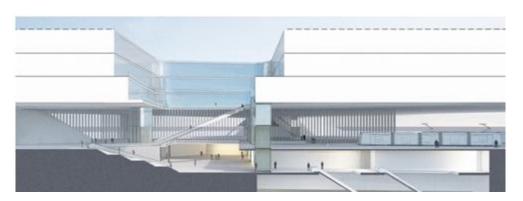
Enghave Brygge, deep underground station, Typical Cross section
